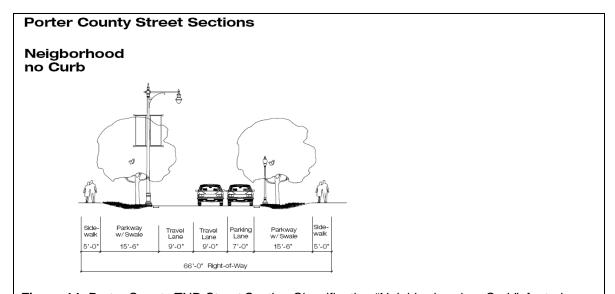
Porter County TND Street Section Classification "Neighborhood no Curb": featuring sidewalk, parkway with swale, travel lanes and parking lane.
